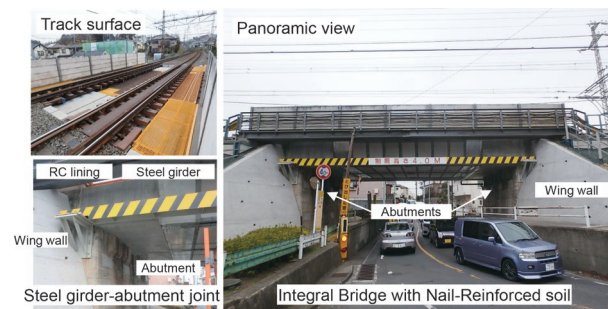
Applying the Integral Reinforcement Method with Nail-Reinforced Soil to an actual existing steel bridge
